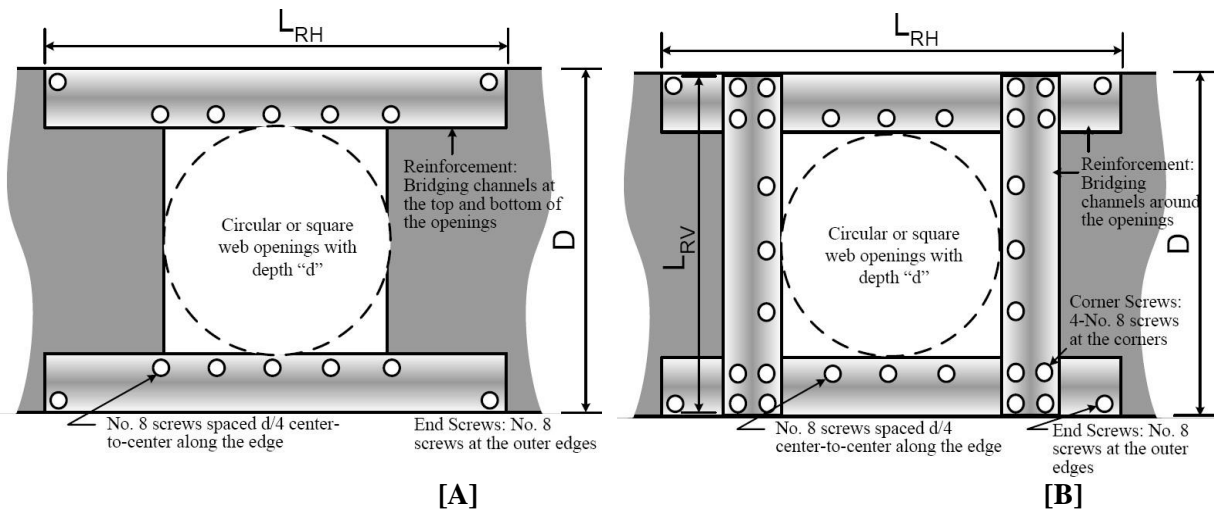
Proposed Reinforcement Scheme for [A] Flexural Zone, [B] Shear Zone
